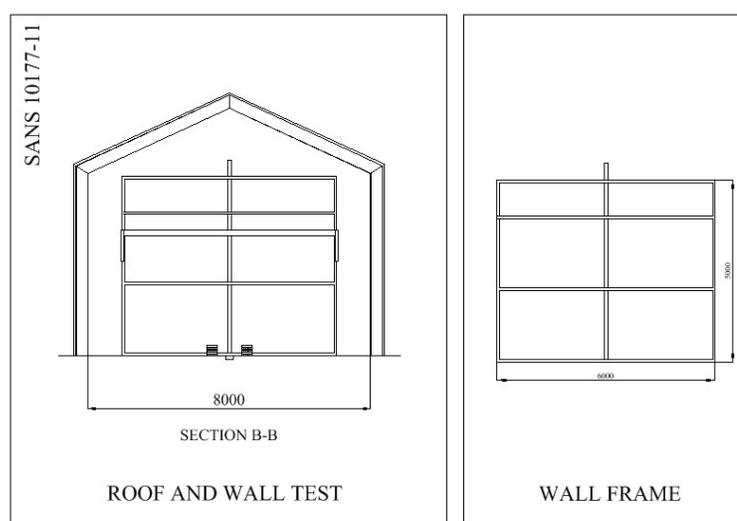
Typical side-cladding installation in SANS 10177 Part 11 facility
